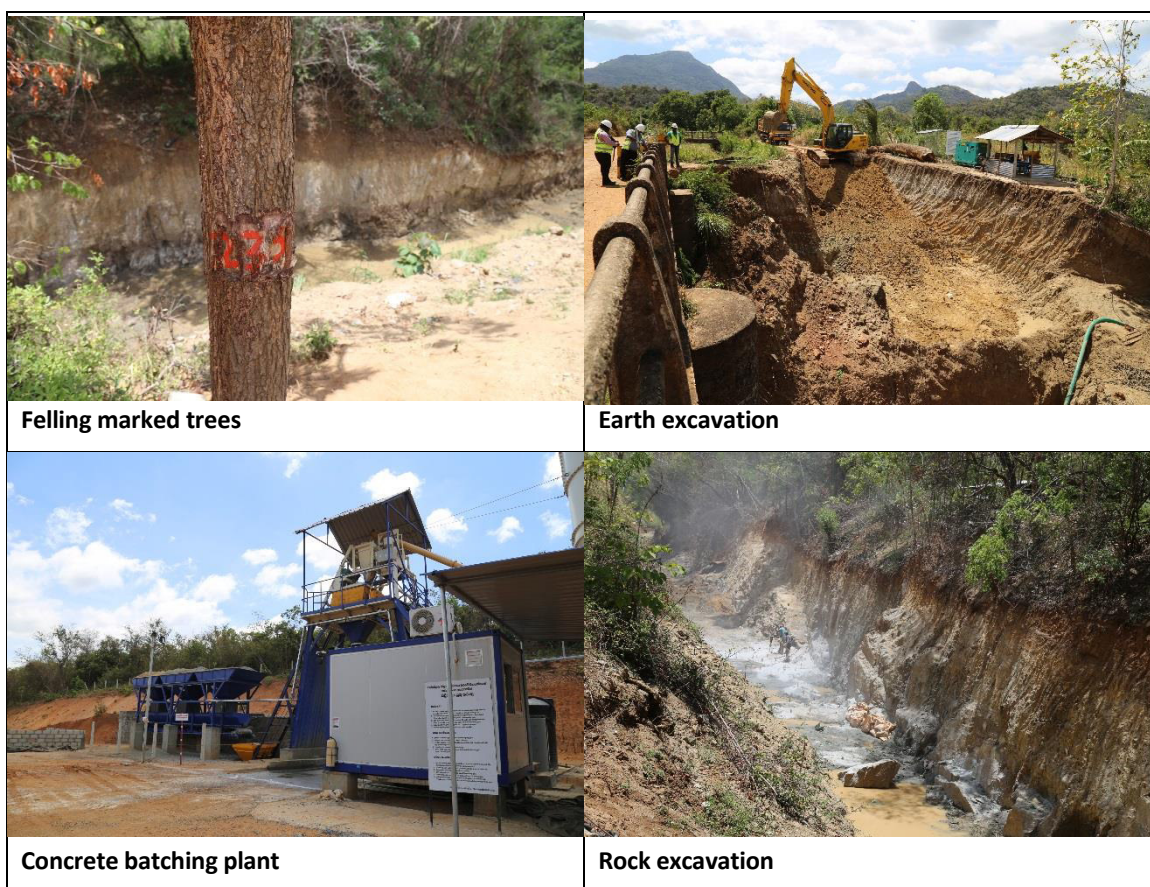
Photographic evidences for the site preparatory and construction work in the site
